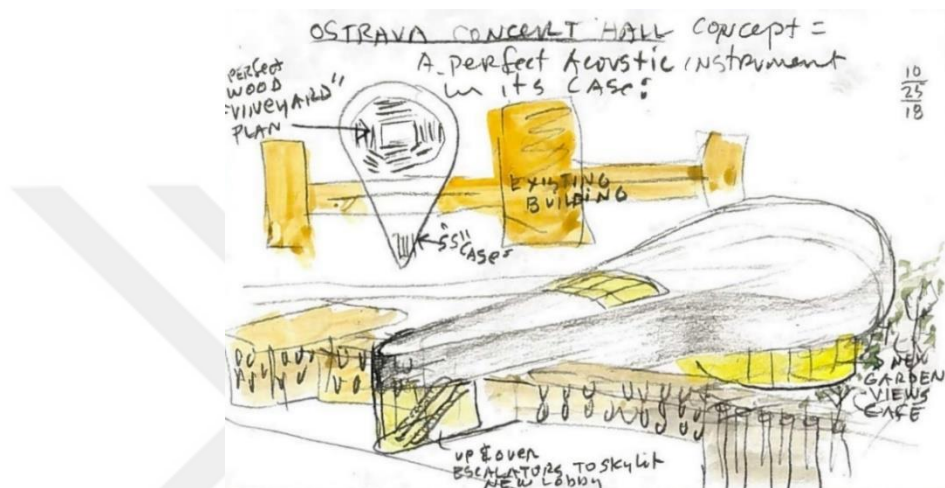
Ostrava Concert Hall, Steven Holl Architects (Url-30).
